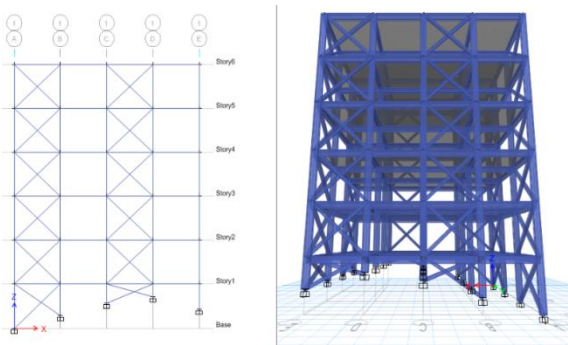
Typical plan and 3D view of Model-2 provided with complete infill wall
